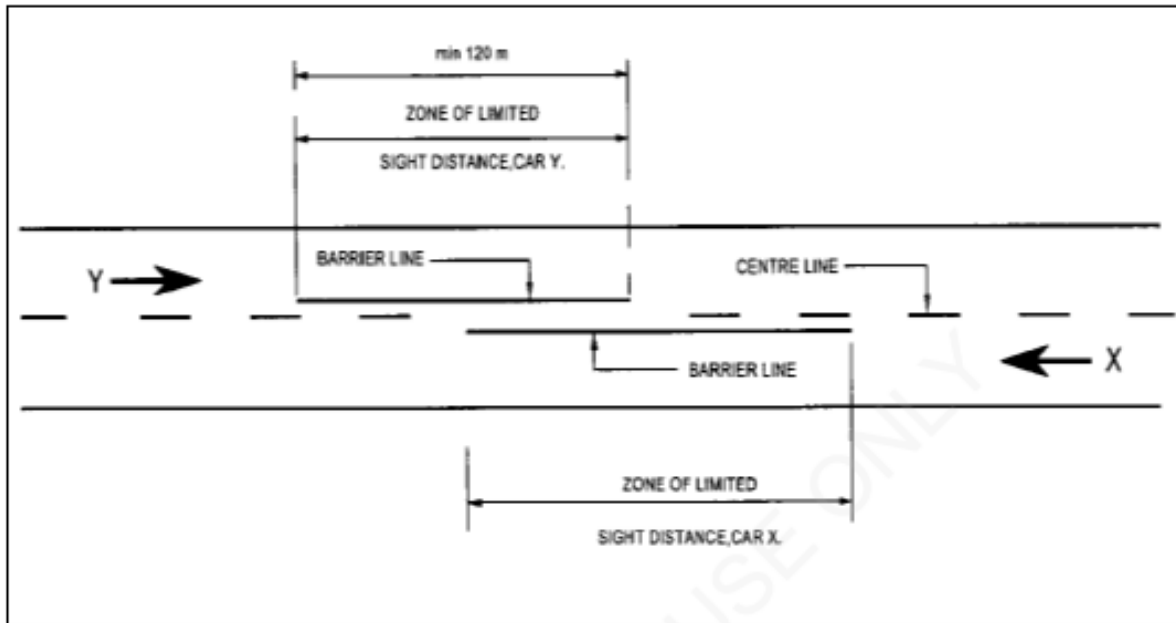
PAVEMENT MARKING FOR NO-PASSING ZONES
